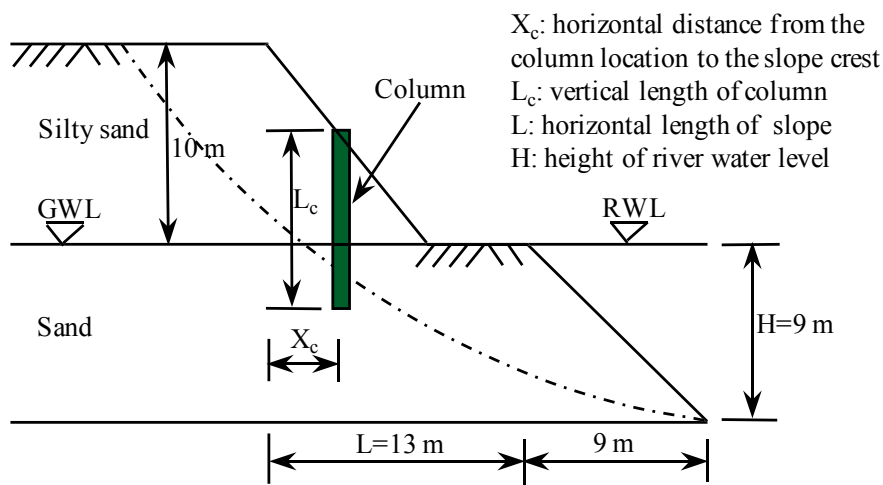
Typical schematic of a riverbank reinforced with DCM columns
